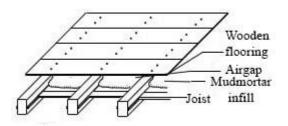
Floor details of houses in Safranbolu (Eraslan, 2009, pp 47).
